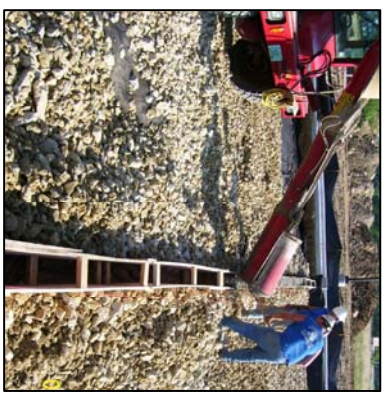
B. TERRACES IN PERVIOUS CONCRETE PAVEMENT SYSTEM RECHARGE BED WITH LONG SLOPES.
